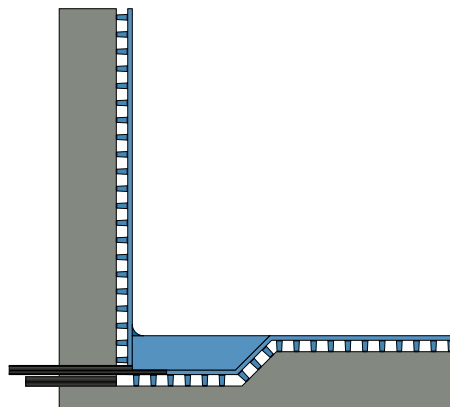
Sump pit with leakage monitoring and exhaust pipe (rectangular)
